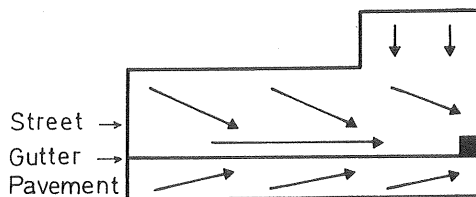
A part of a street with gutter, pavement and inlet
